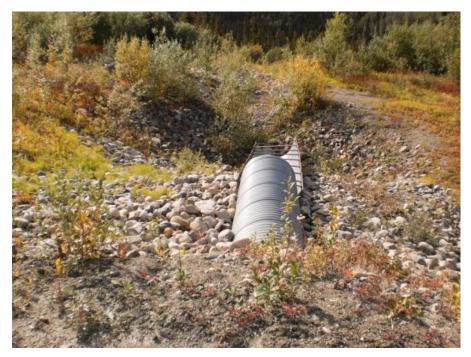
Culvert emergency spillway at left (south) abutment (August 23, 2011)
